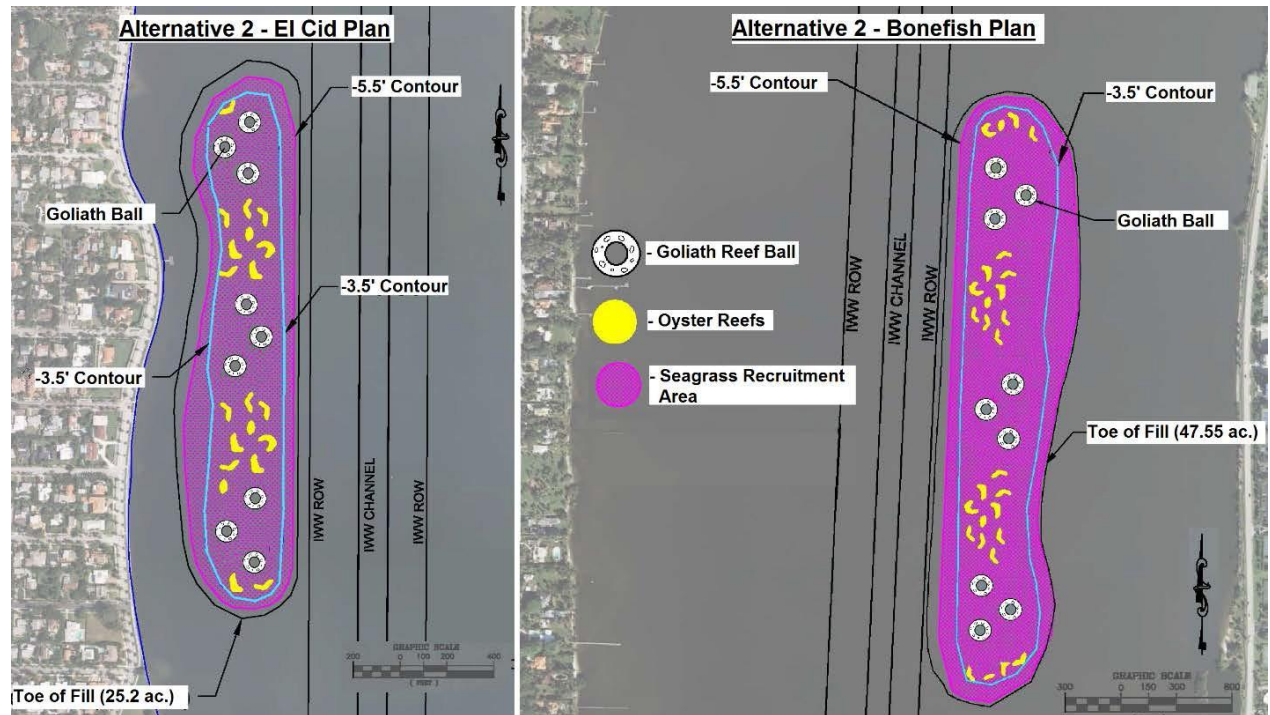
Plan View of Alternative 2 (Sand Capping)
